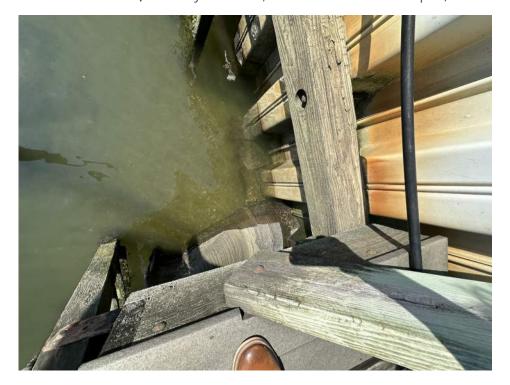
Section C, Westerly Bulkhead, Outfall Pipe with Outfall Backflow Preventer (Tideflex)
